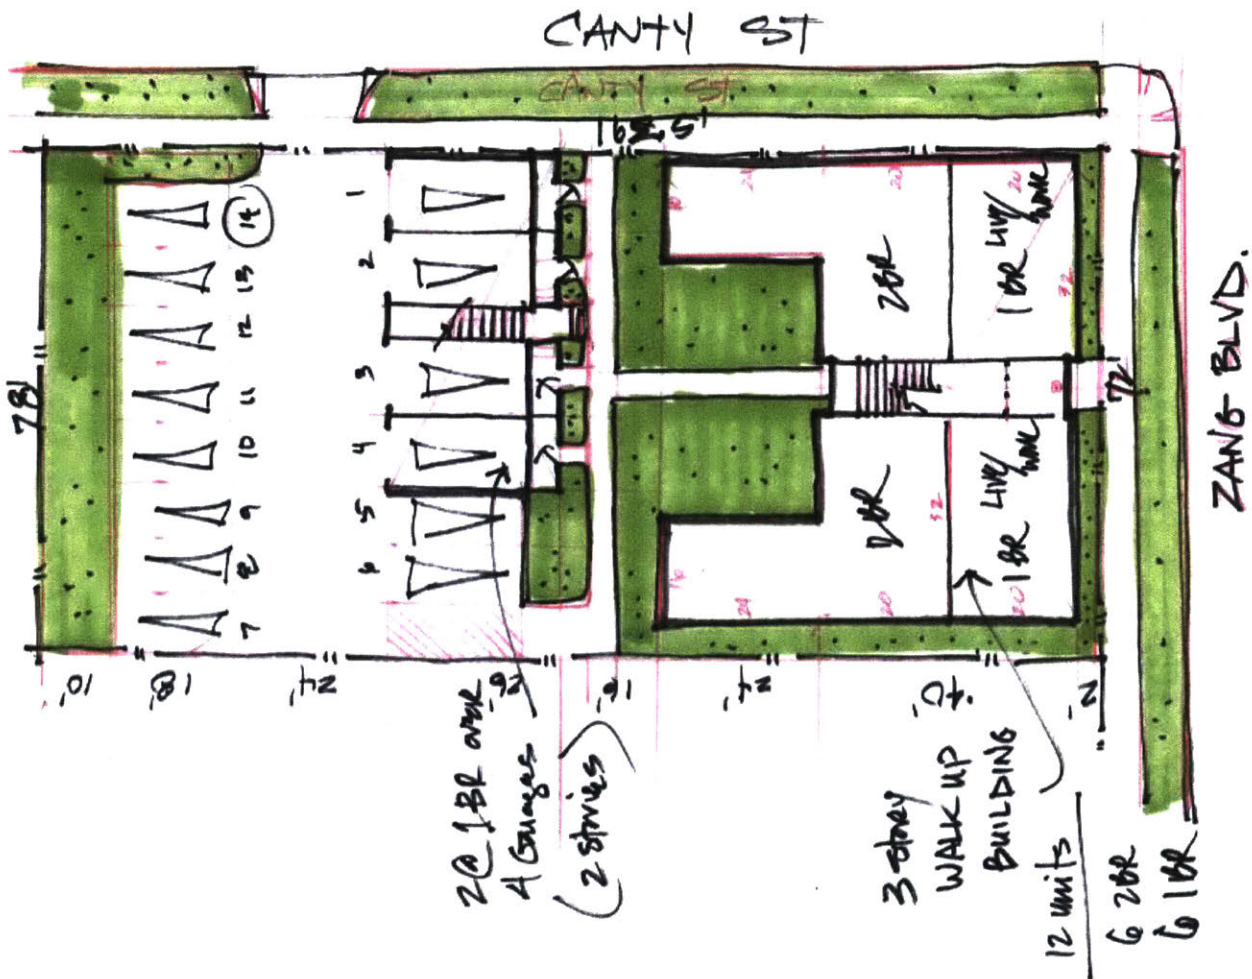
14 Unit Site Plan - 8 One Bedrooms, 6 Two Bedrooms, 4 Garages, 4 Storage Units & 10 Parking Spaces
